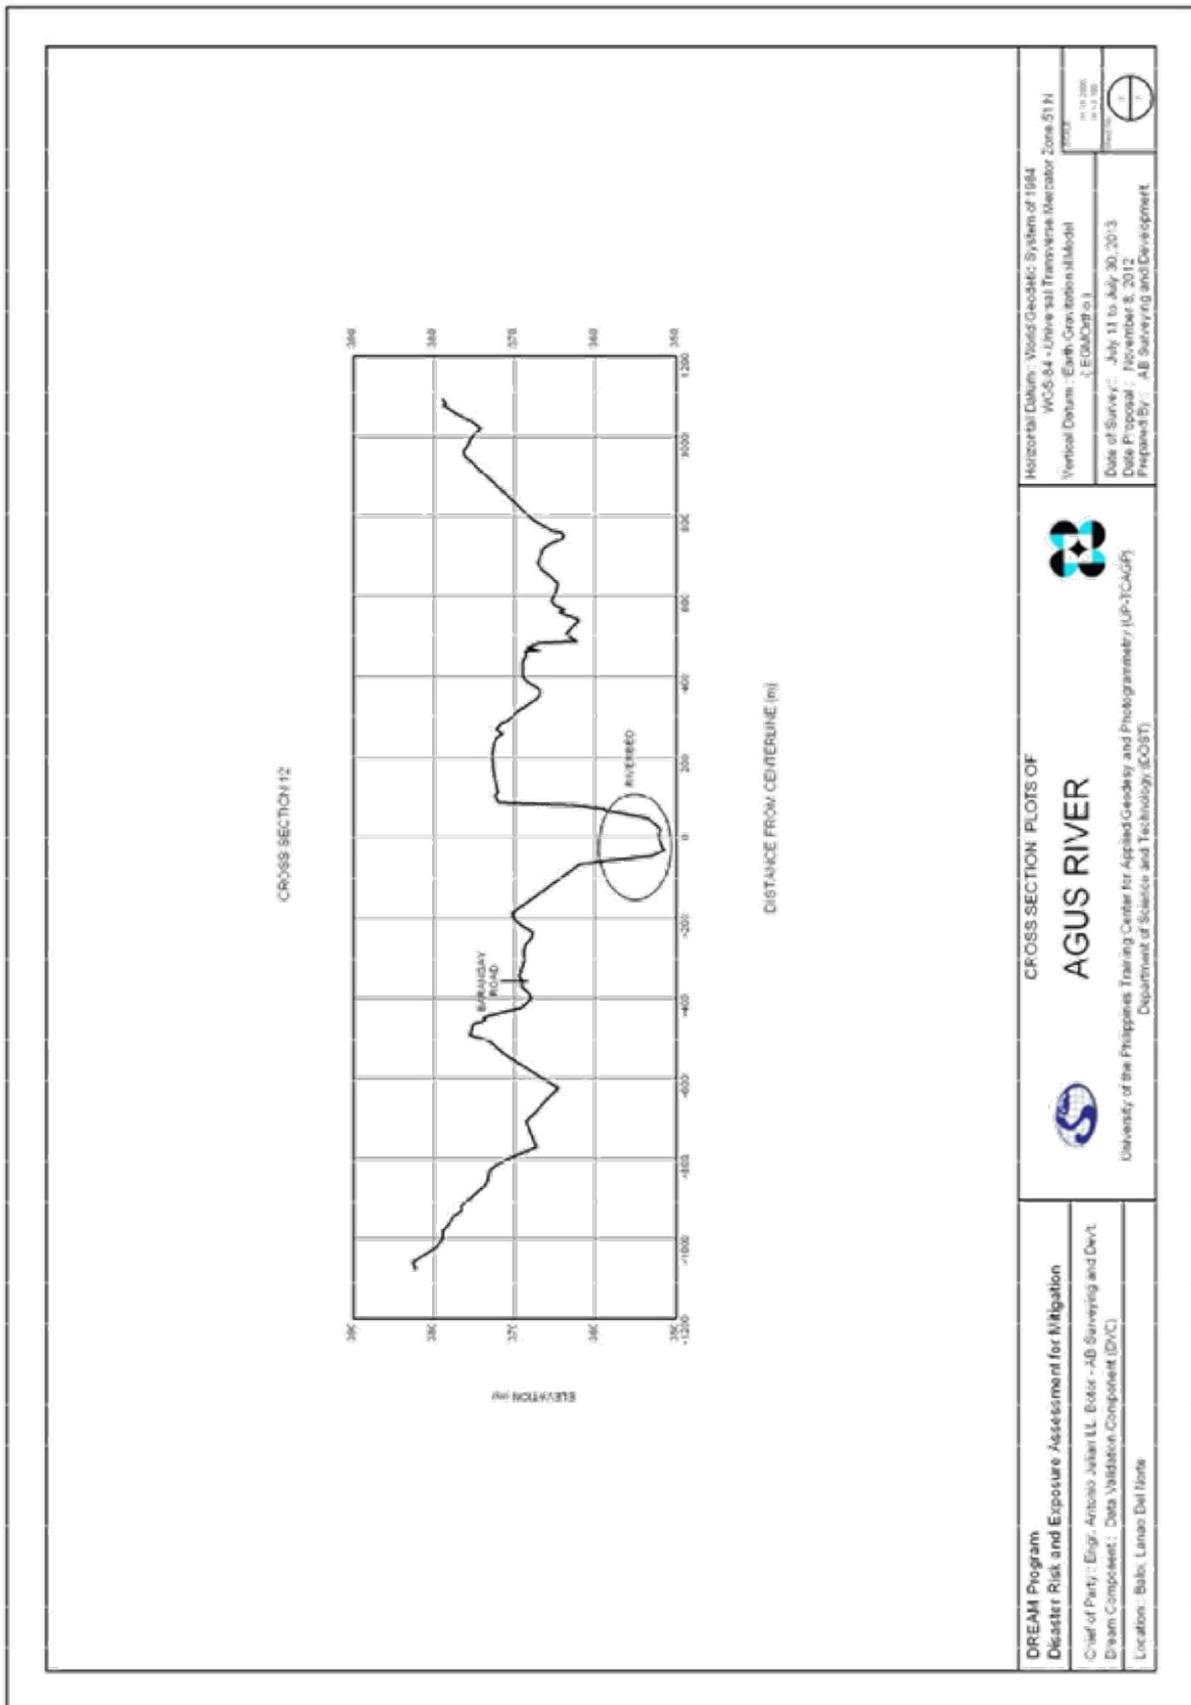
Sheet No.6 of the Cross-section plan of Agus River
